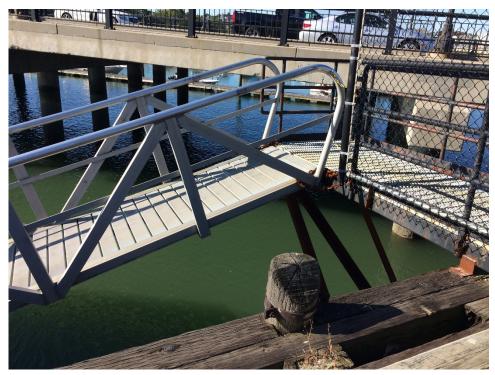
View of bulkhead and pile connection looking east in Reserved Channel.
